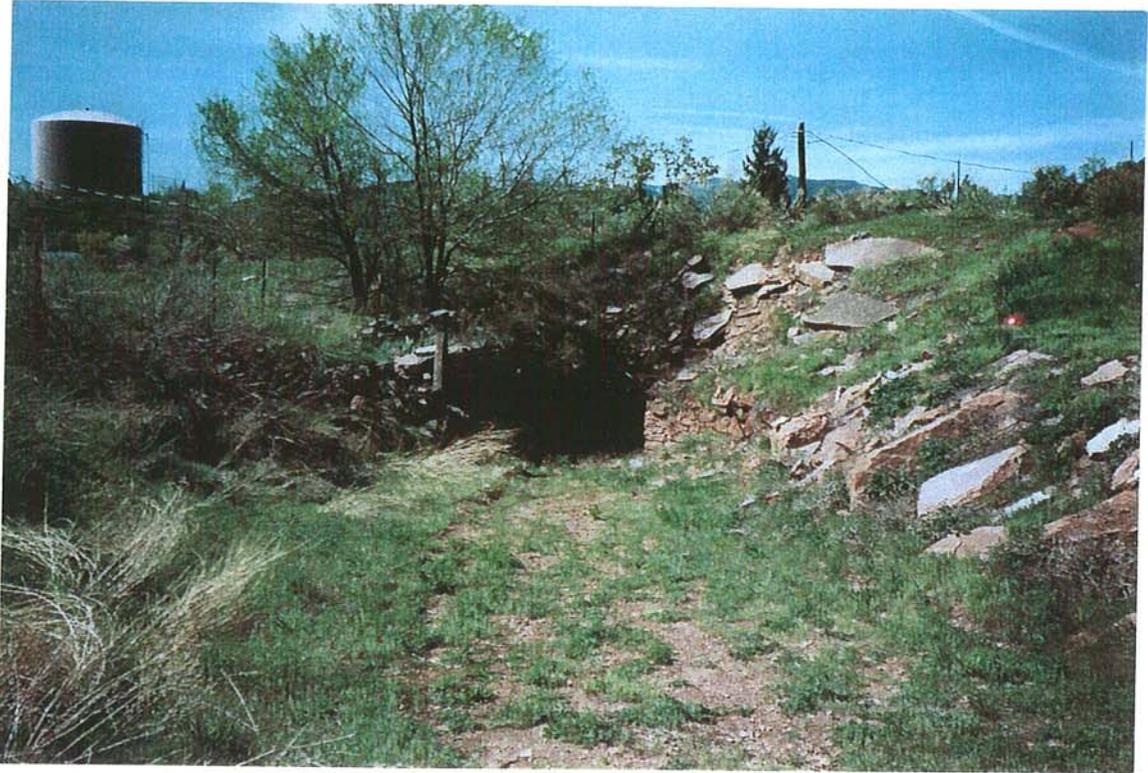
View looking downstream at the 3'-9" x 3'-6" flagstone box culvert under the historic railroad embankment on the upper 4th Avenue drainage basin. This culvert had become plugged and was recently opened which led to flooding of a downstream property. This stone culvert is similar to the other culvert also under the railroad embankment and is located immediately east of the pond described in Photo 1.
